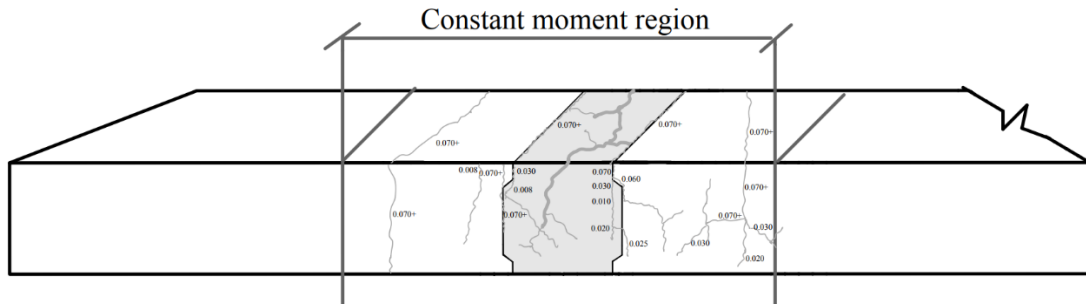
Crack Propagation for Proprietary Short-Term Specimen at Failure
